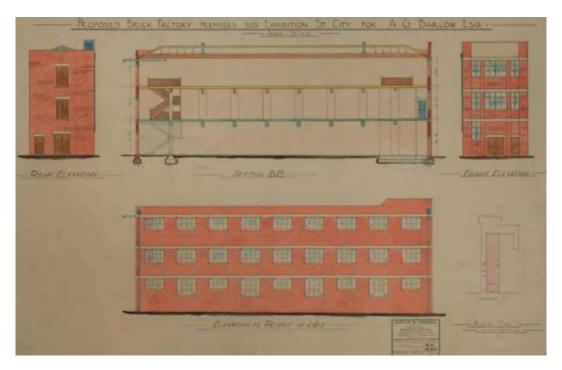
Architect Arthur W Purnell's design for Barlow Motors Pty Ltd's building at 353 Exhibition Street. (Source: Groves 2009:33)
